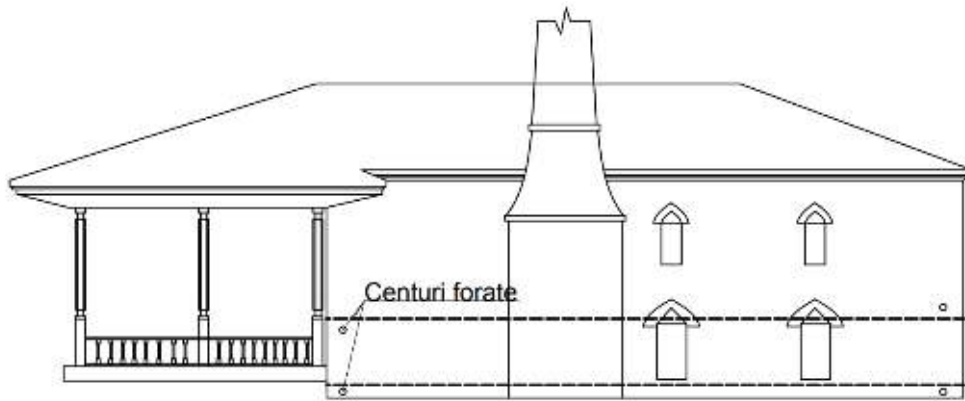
Perforated belts arrangement plan – Esmahan Sultan mosque
